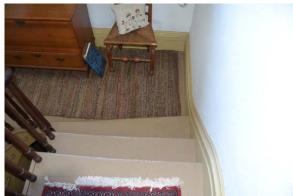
View down to the landing from the second floor hall. Note the slight pie shaped tread at the bottom.
